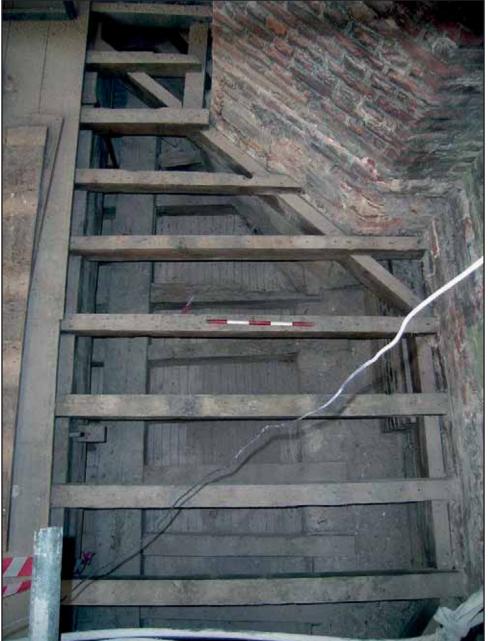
Carpenter's marks on the south side of Tie Beam 3 and its joists, the Flat Roof, looking north
